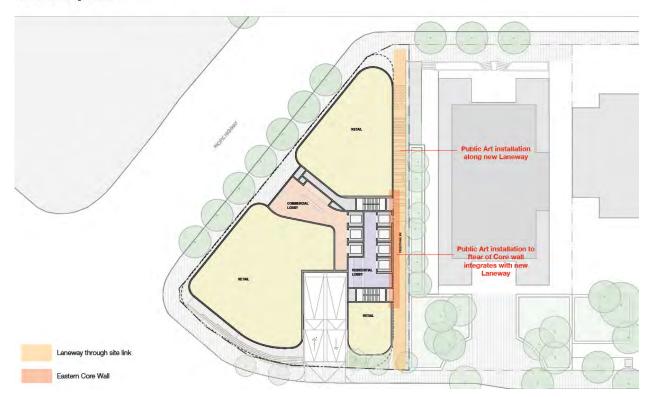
Public Art Integration and Through Site Link (Source: Architectural Design Report, FJMT)
